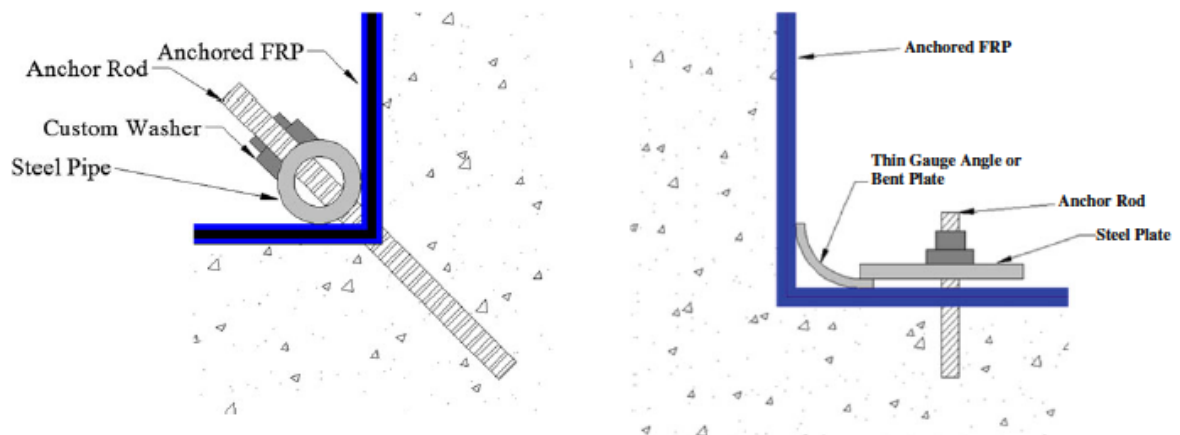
21 - Example of cylindrical hollow section anchorage system (Galle and Sneed, 2013)
